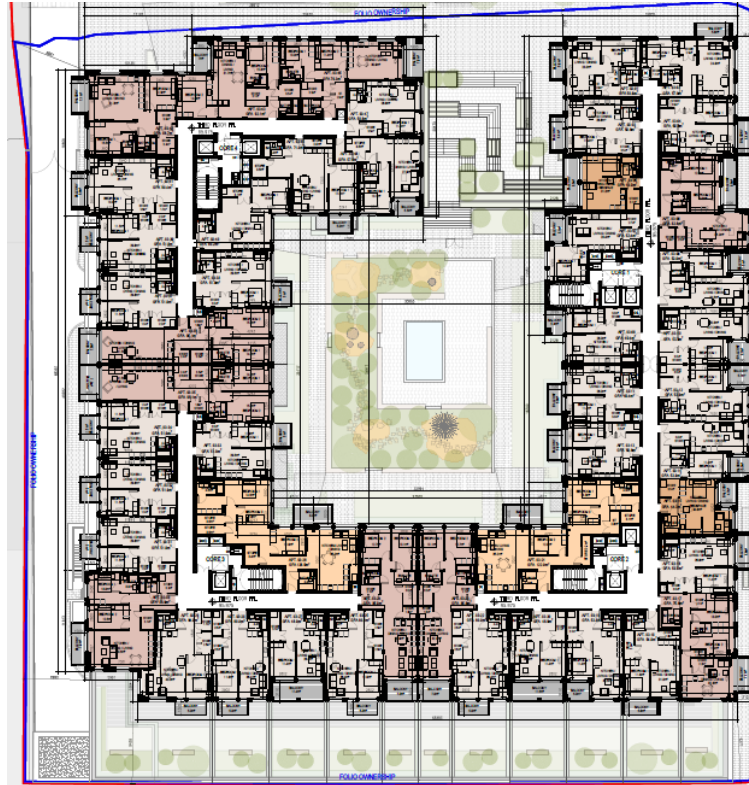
Third floor plan. 2 no. studio apartments, 33 no. one-bedroom apartments, 10 no. two-bedroom apartments and 2 no. three-bedroom apartments are provided at this level.
